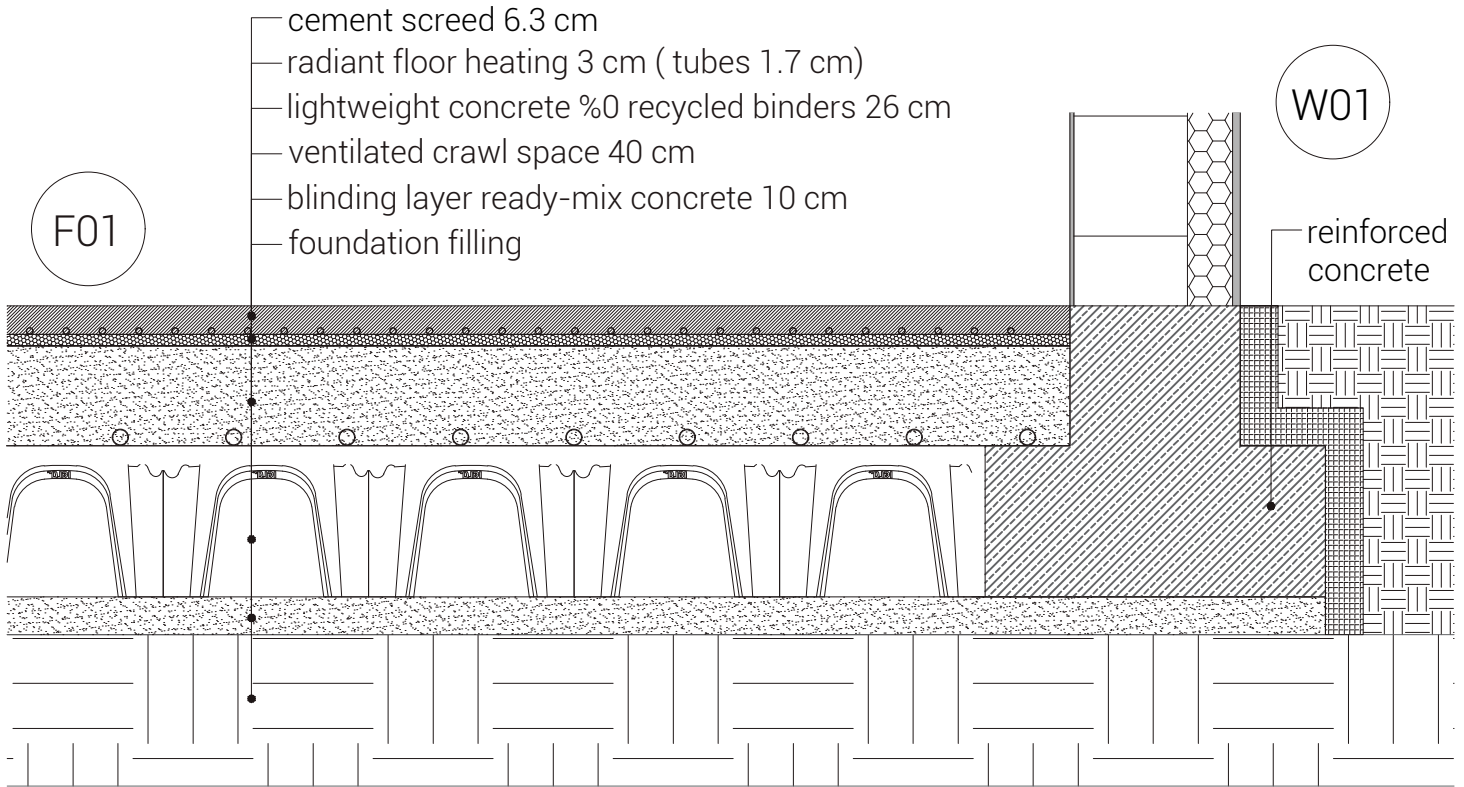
BAU FOUNDATION / GROUND FLOOR SLAB (F01)
